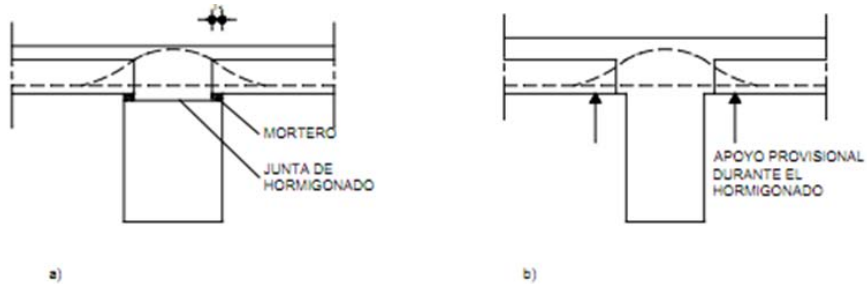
Indirect supports with connecting reinforcement in joints or voids:
